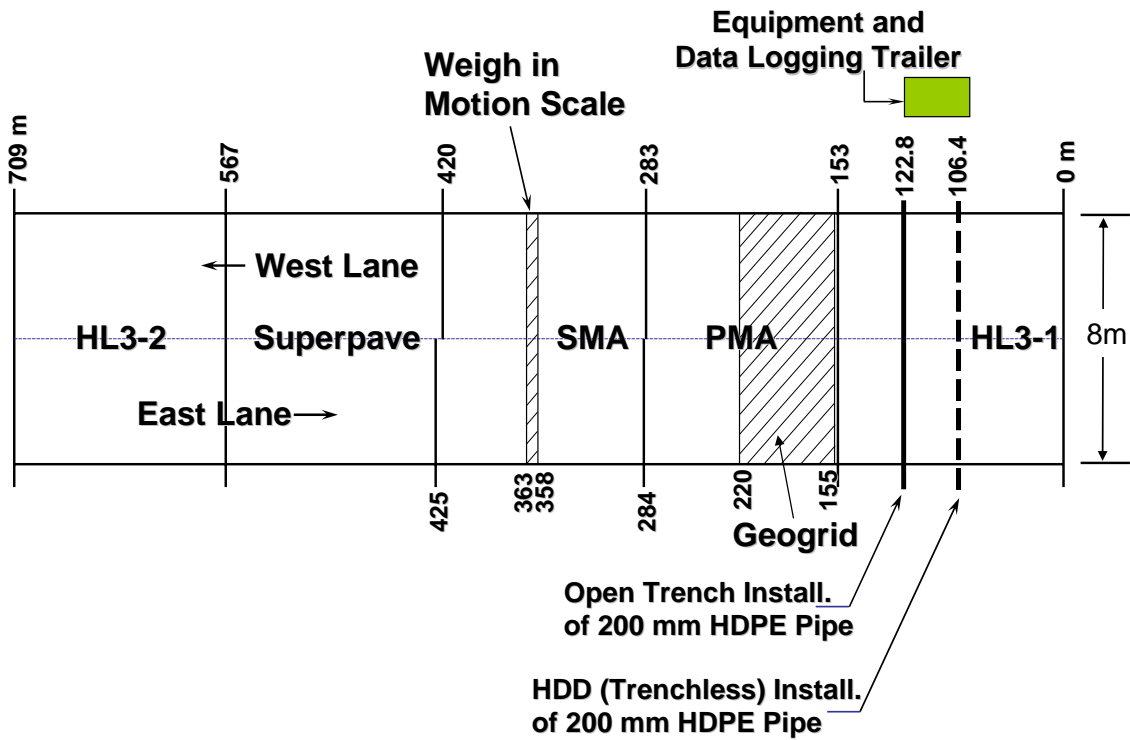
Layout of CPATT torture test track showing position of pipe installed pipes.
